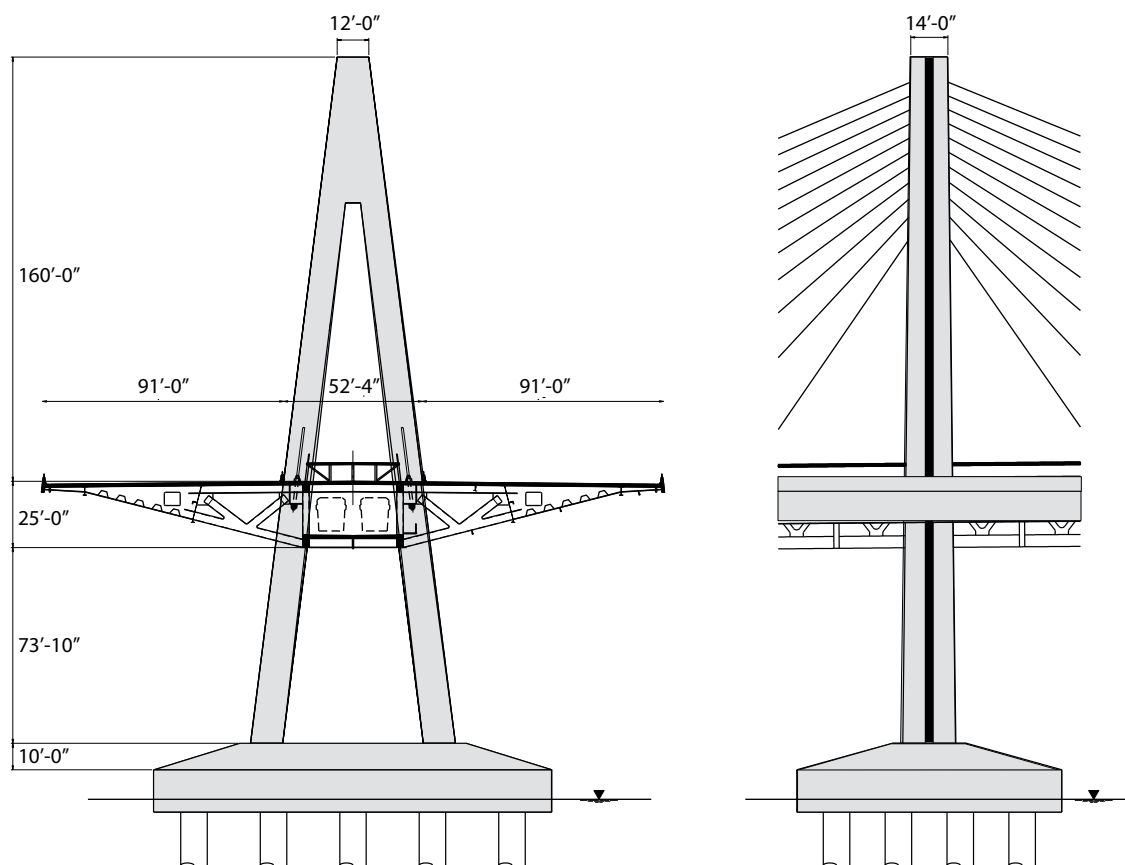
Tower Elevations; Cable-Stayed Bridge
